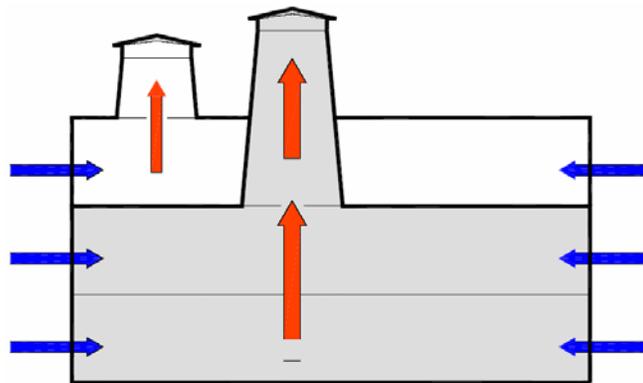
Zoning of natural ventilation in the IVEG Building
